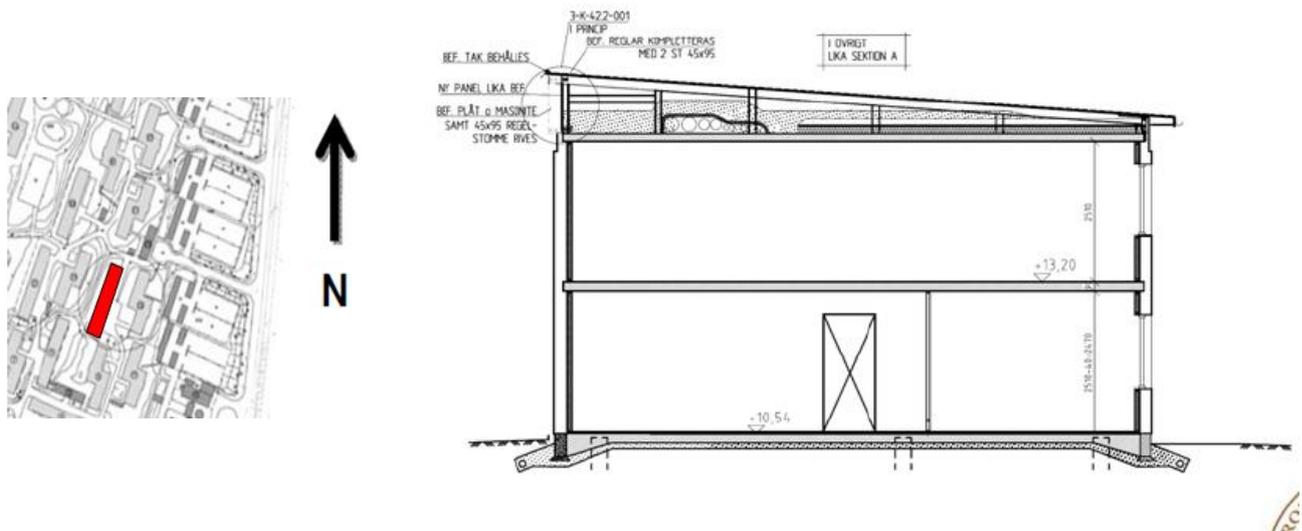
Left: Spatial plan of the buildings in Sigtuna. Right: Vertical cross-section through the attic before retrofitting
